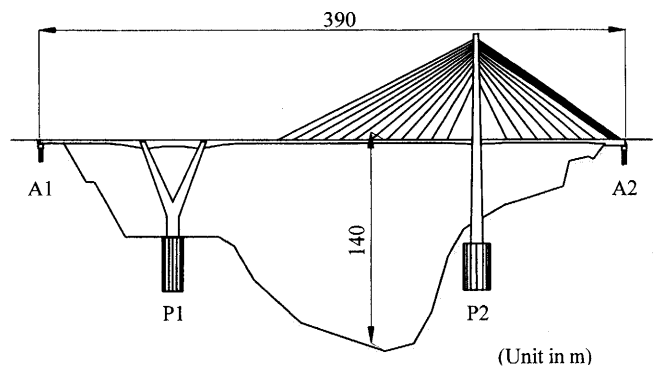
The Ayunose Bridge, a concrete cable-stayed vehicle bridge.
